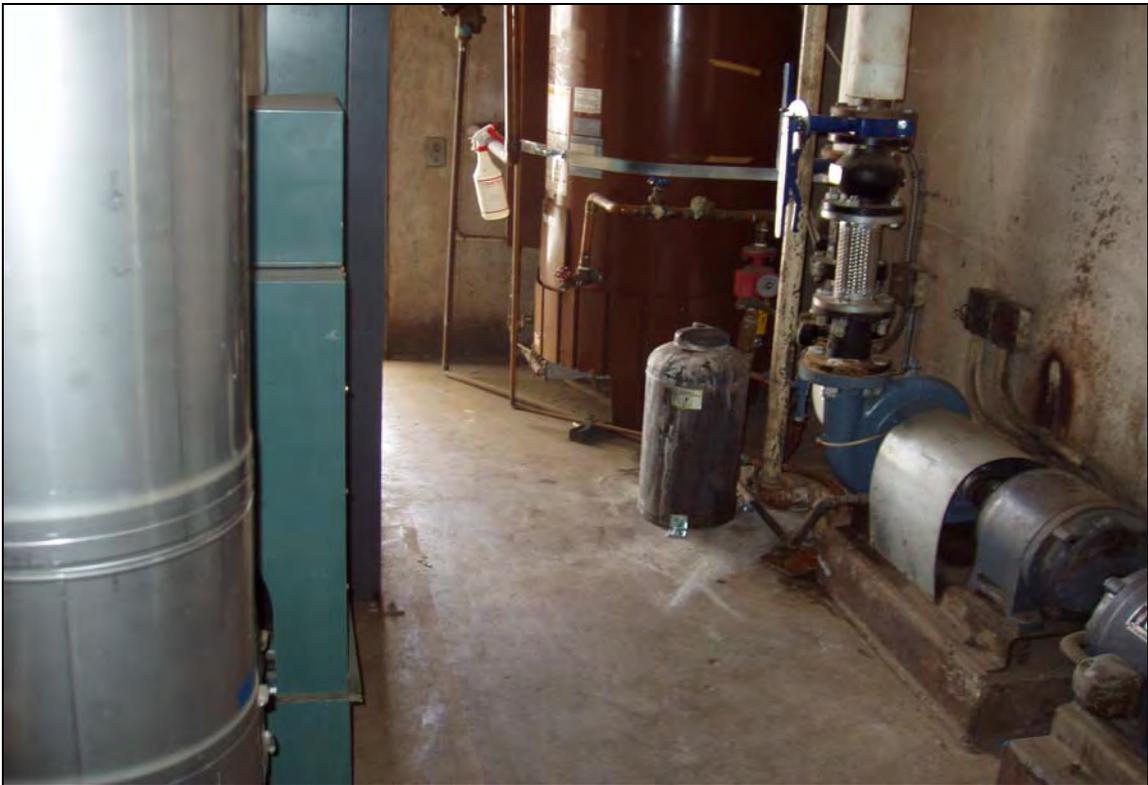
View of chillers and water pipes in mechanical room in basement.
